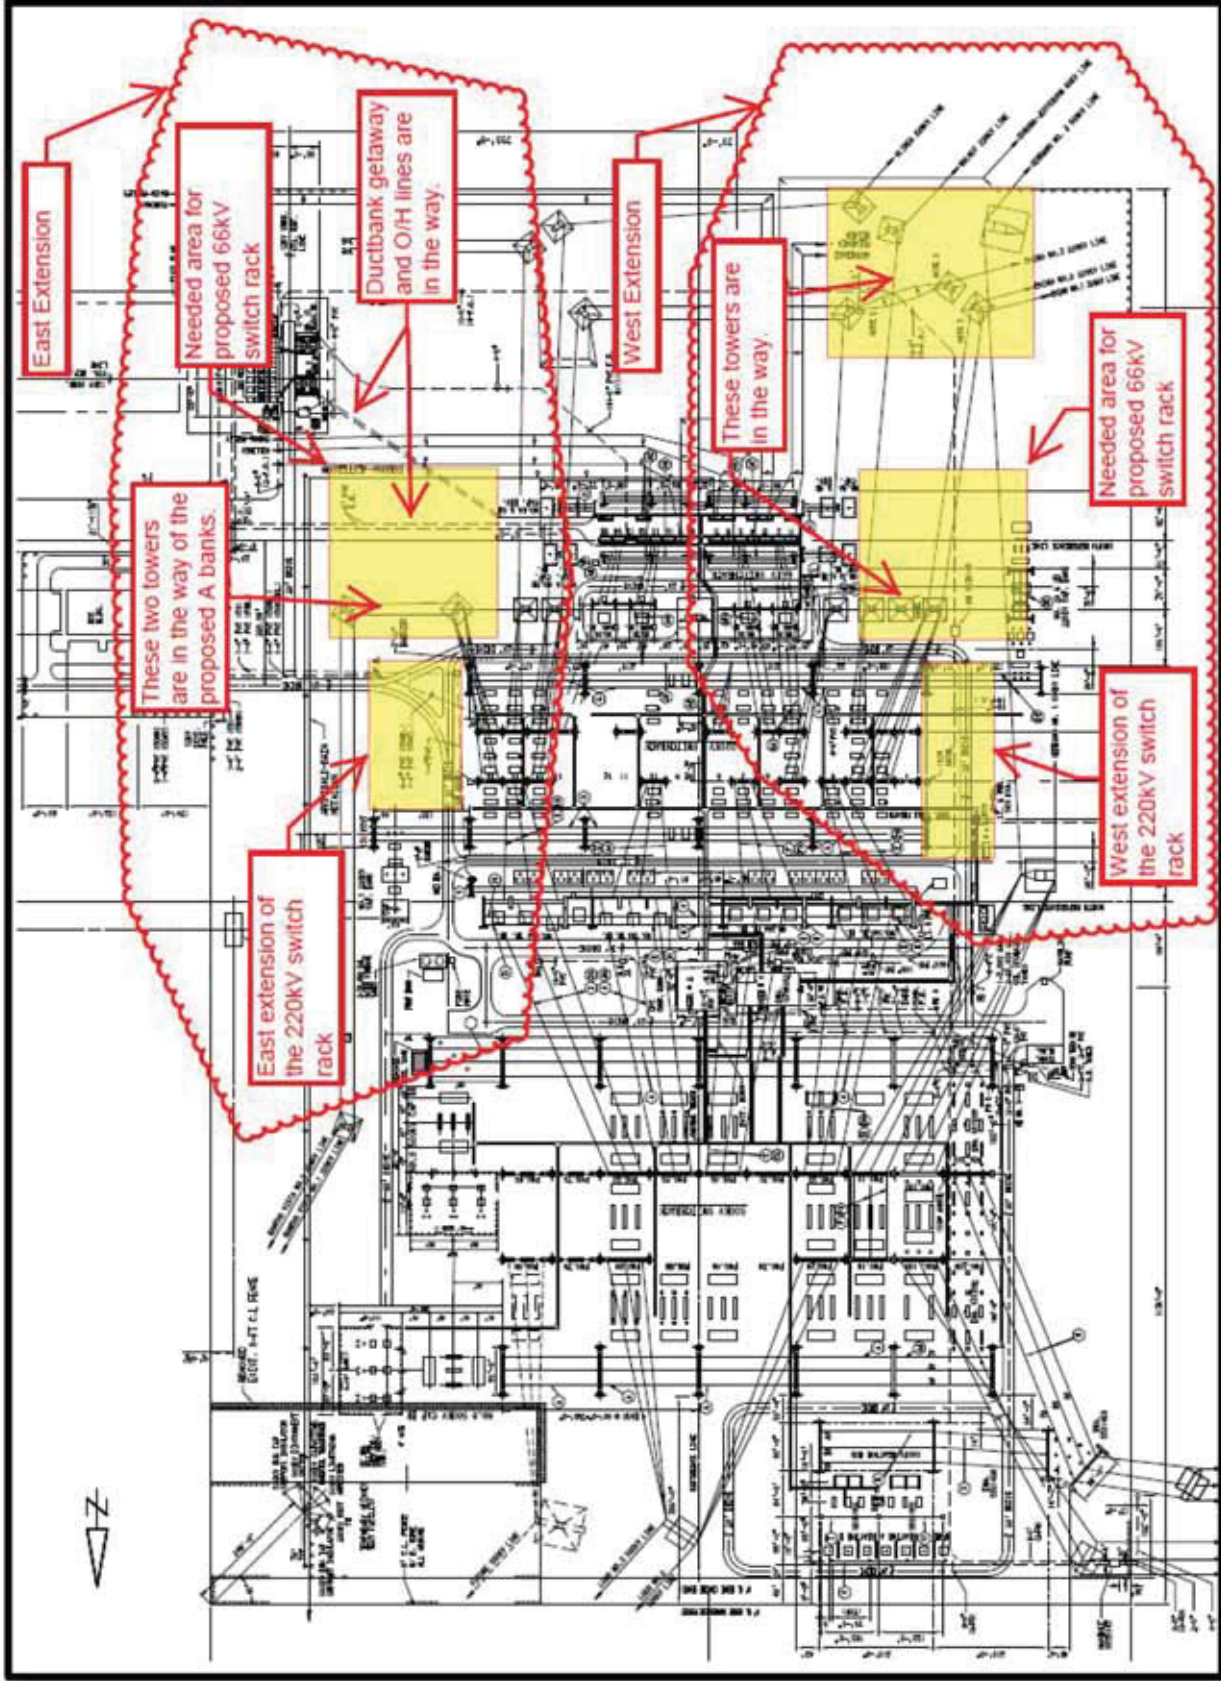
MIRA LOMA SUBSTATION PLOT PLAN
